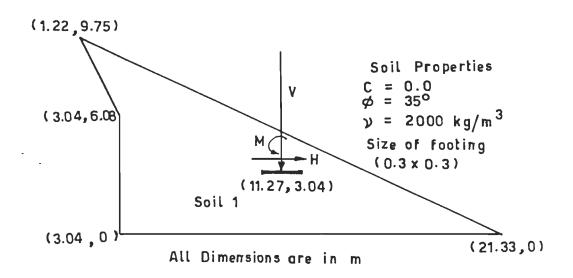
Cross Section of the Slope with Single Column Load
